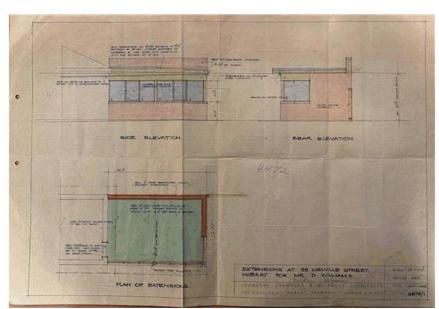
Architectural plan for 1968-69: Extension at the rear of the building (TAHO: building application record 69138)
